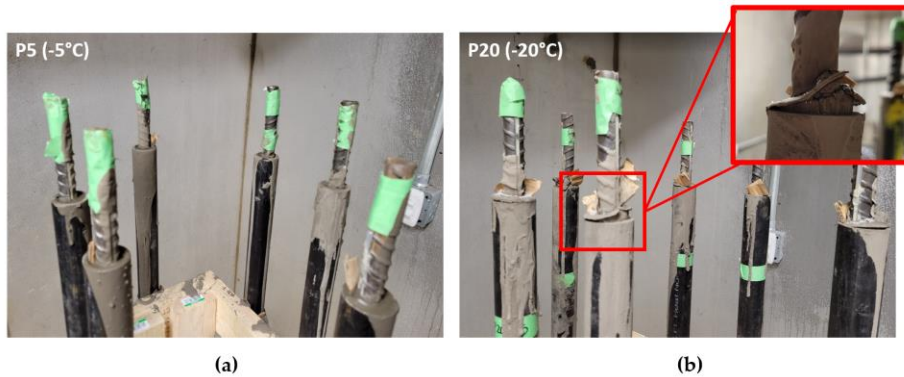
Grouted FGRB specimens: (a) P5 specimens; (b) P20 specimens – grout expanded out of the confinement pipes after grouting completed
